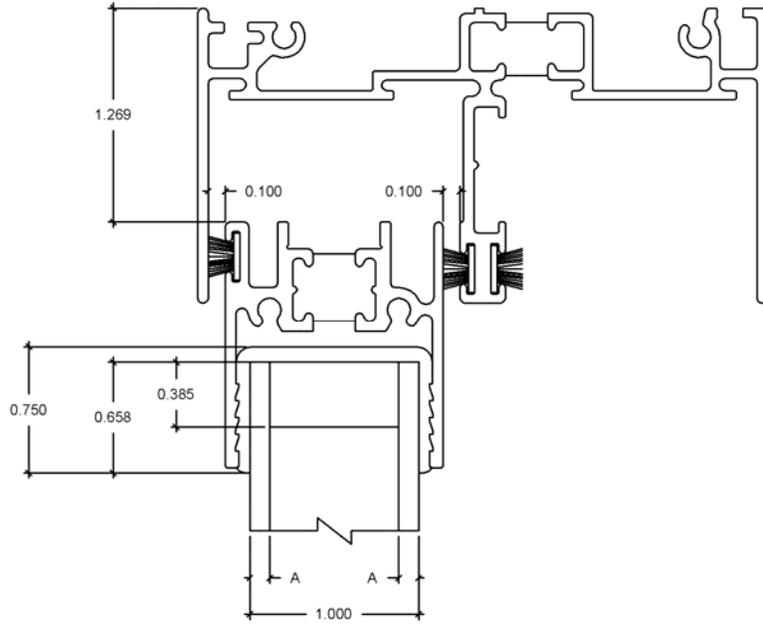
Dimensioned drawing for the head fixed cross section.
